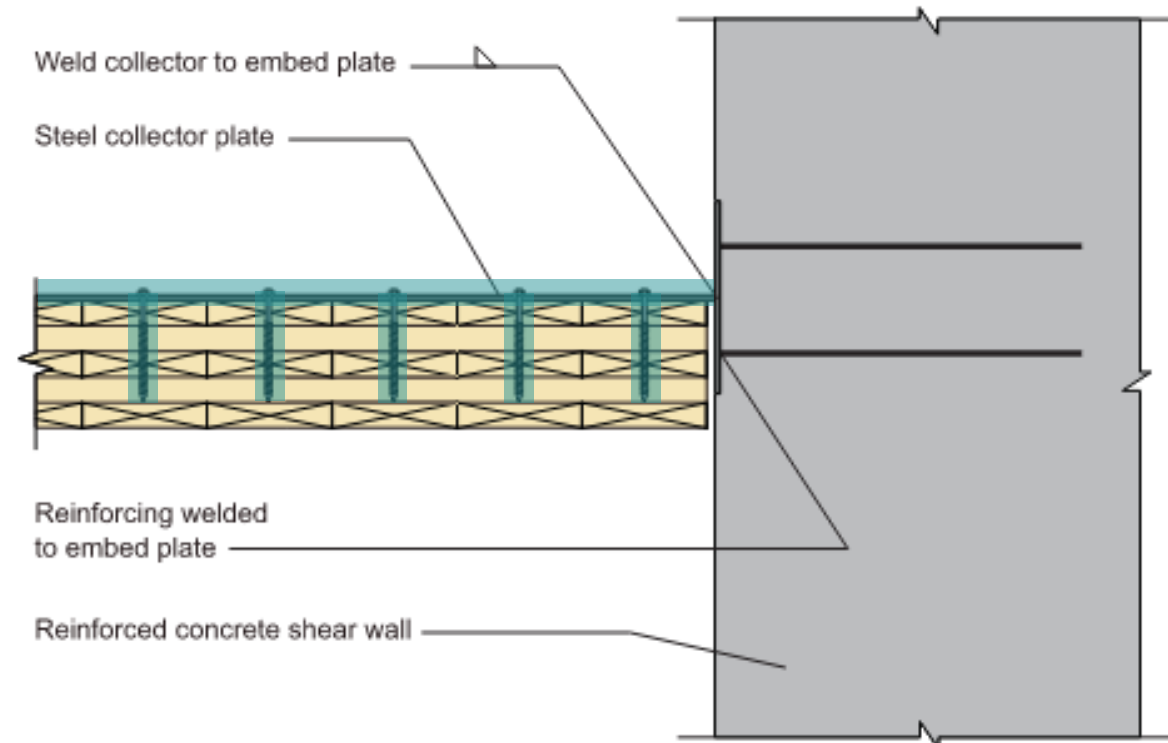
Collector plate to embed plate in concrete wall connection
